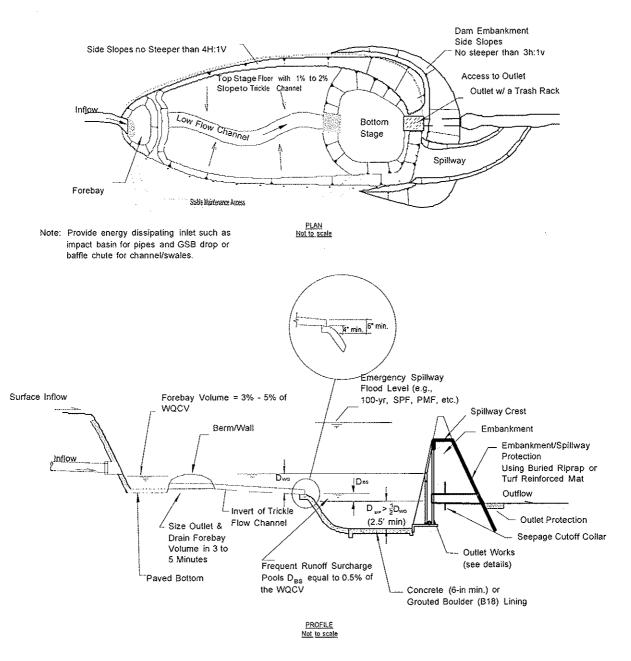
Extended Detention Basin (EDB) Plan and Sections
